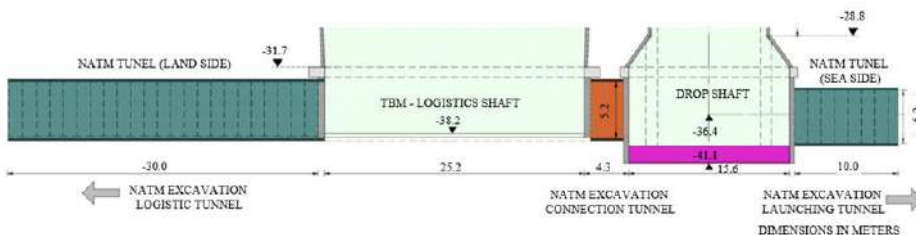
NATM tunnel sections logistics, connection and launching tunnels. (a) Longitudinal profile Logistics Tunnel, Logistics Shaft, Connection Tunnel, Drop Shaft, TBM Launching Tunnel.
